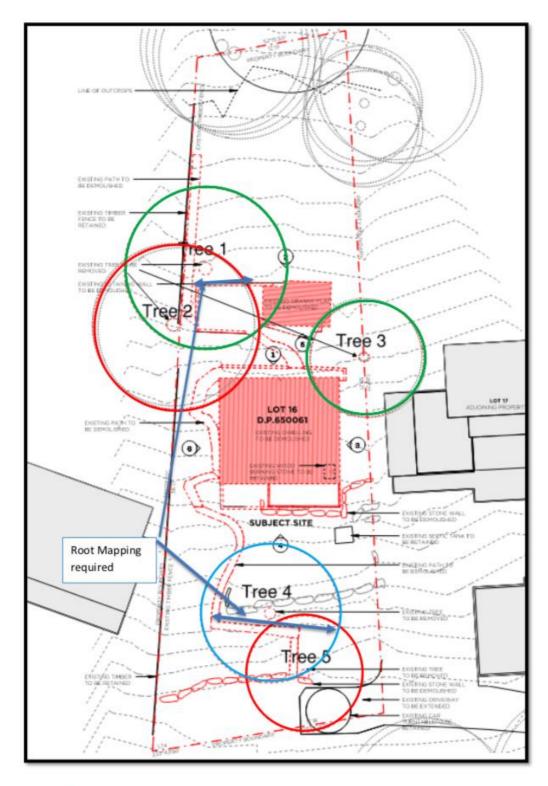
Existing Site Plan - Trees retained - Green, Remove - red, Further investigation - blue.
